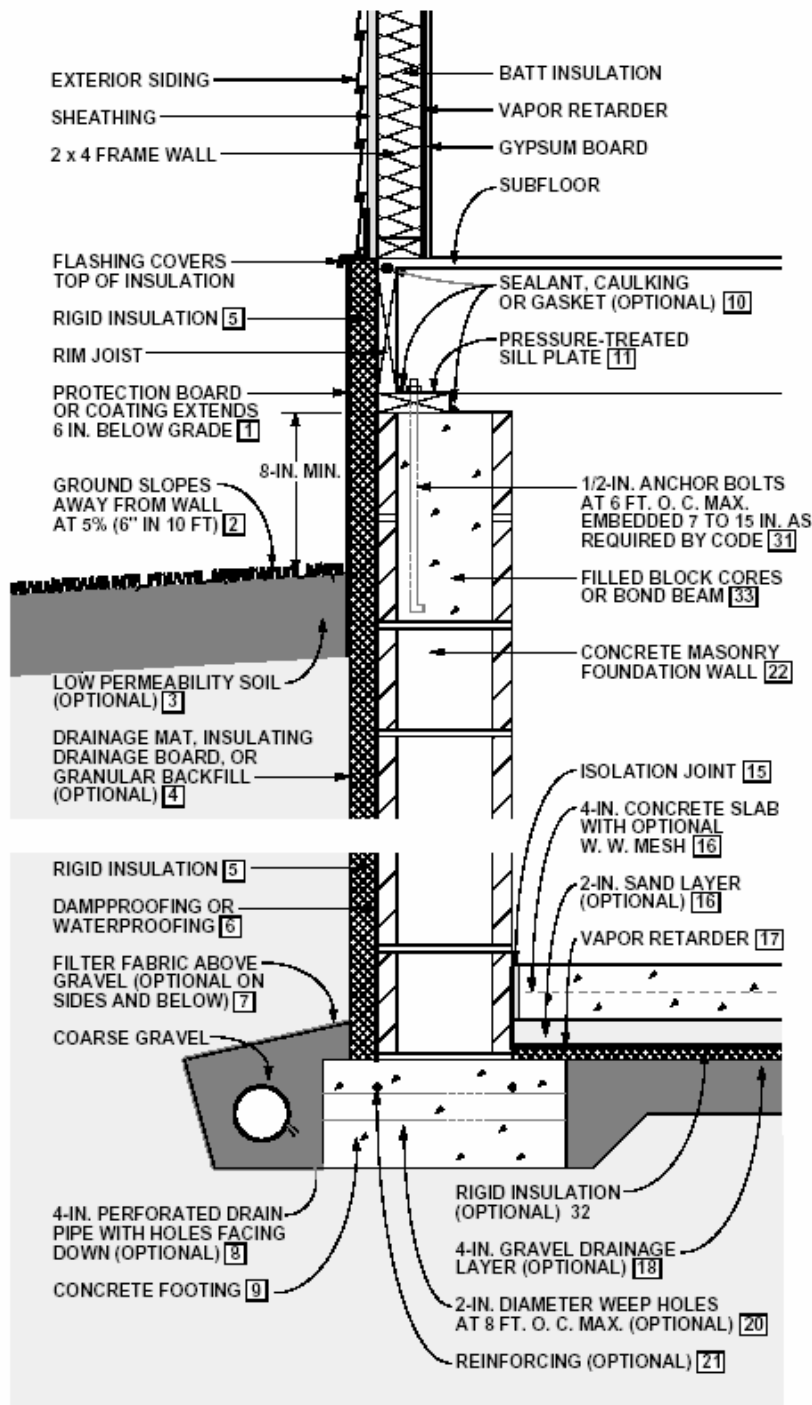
illustrates a concrete masonry foundation wall with exterior insulation. This differs from Figure 2-8 and 2-9 in that the rigid foundation insulation is covered by a flashing material at the top. There is no limit to the thickness of the foundation insulation. The wood frame wall can be either 2 x 4 or 2 x 6 construction and does not overhang the foundation wall. This figure also shows insulation and a sand layer beneath the floor slab.
